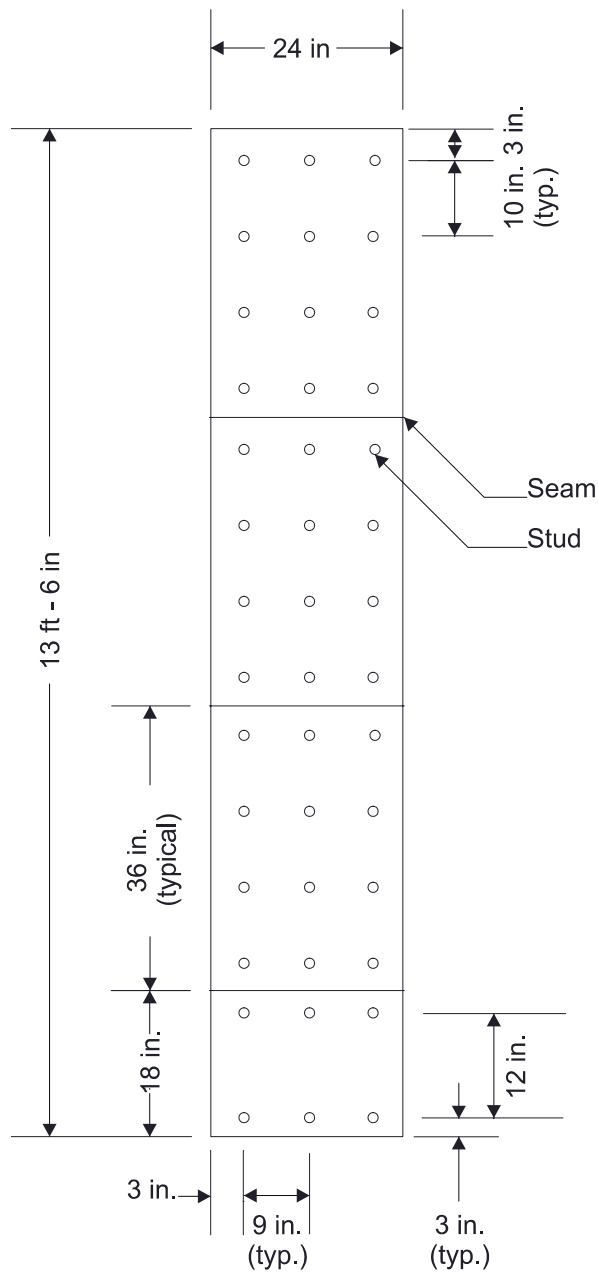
Insulation layout - stud location and seams between stiffeners (typical frame bay panel - plan).
